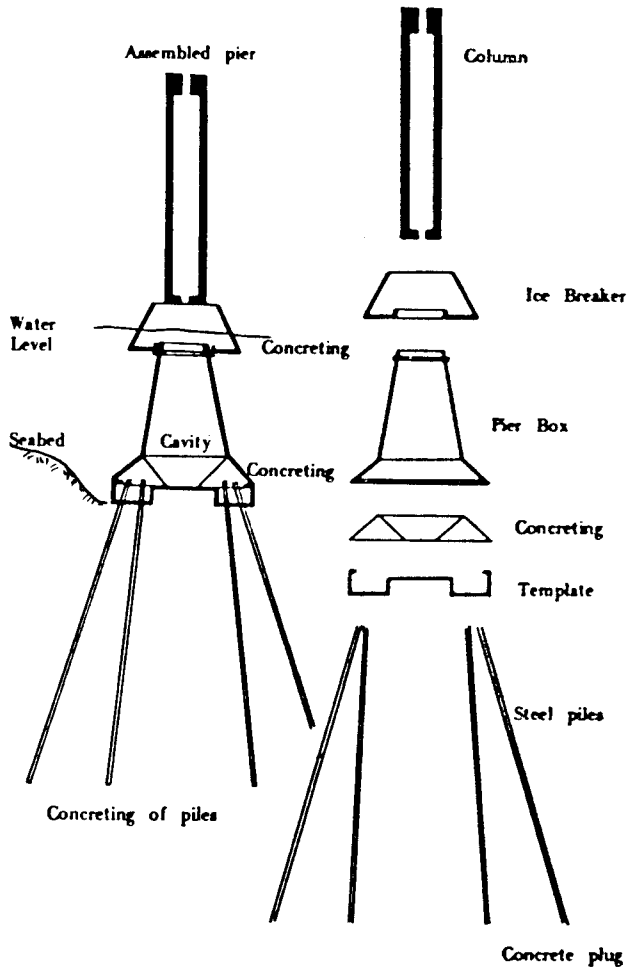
Sallingsund Bridge, schematic of substructure.
